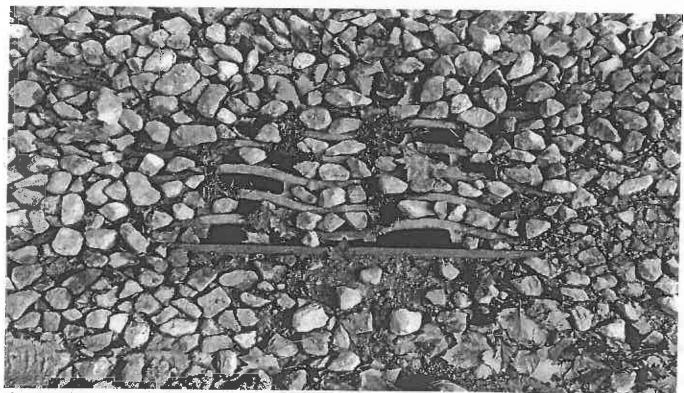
Exposed curb stormdrain off Cole Fieldhouse Road downhill from site
